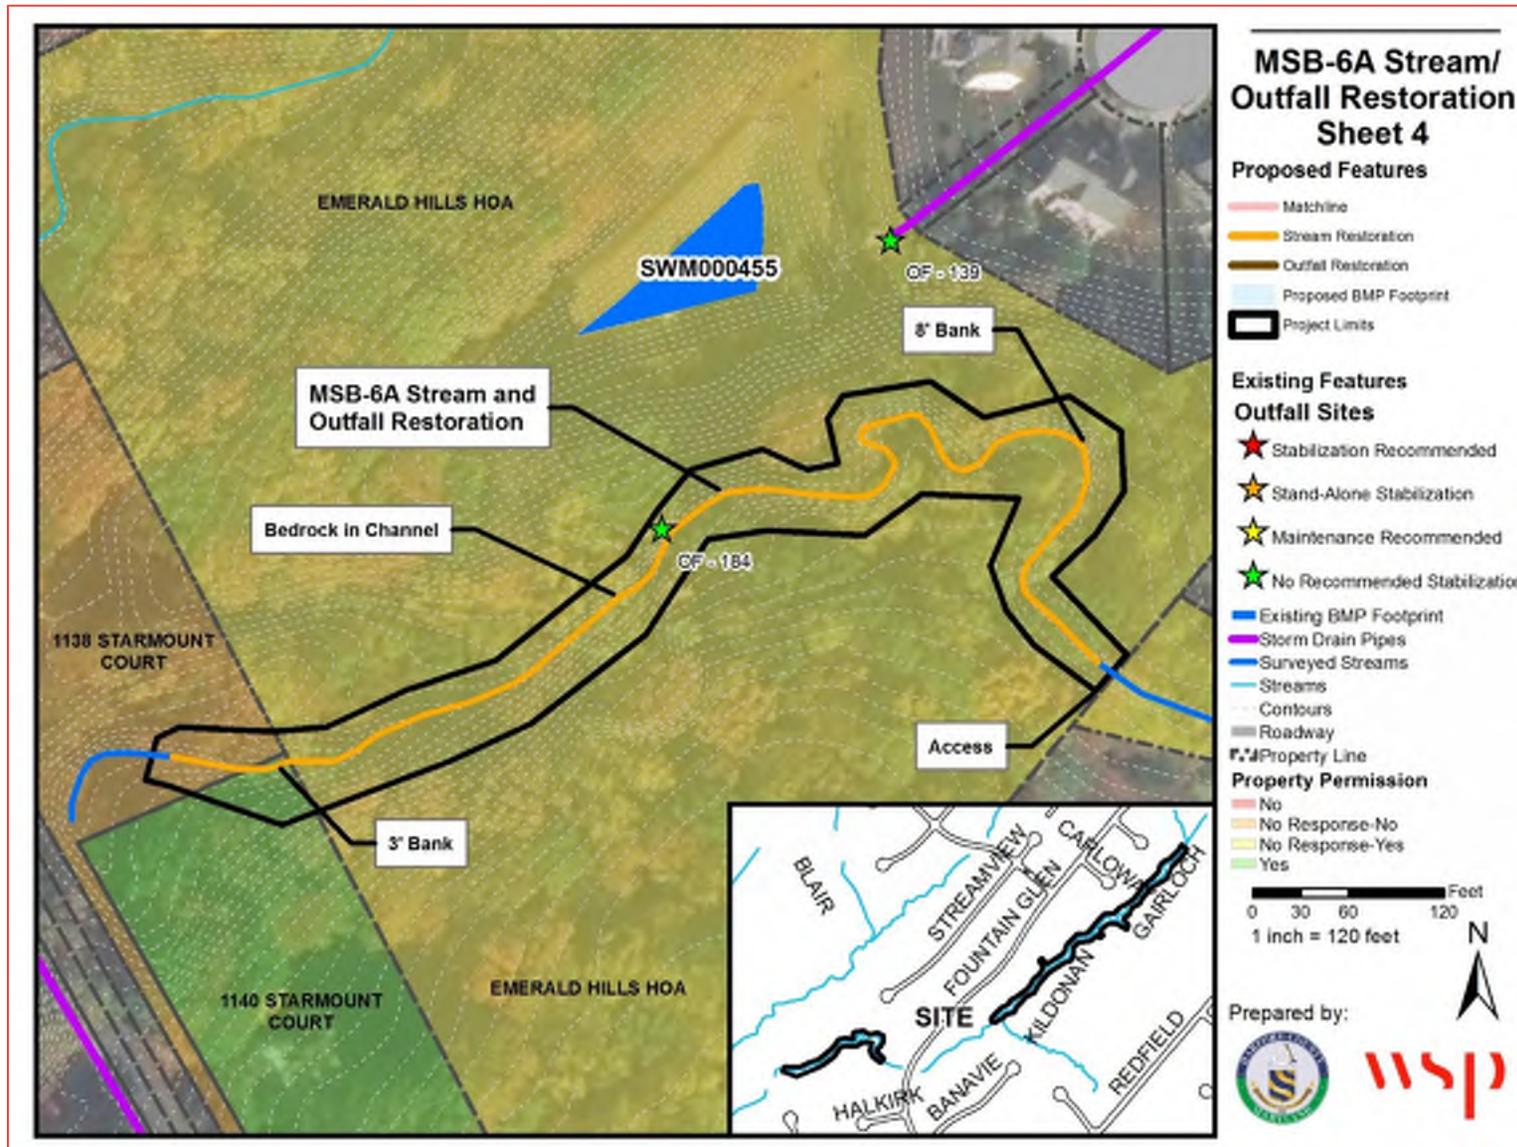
Site Location and Proposed Project Plan for MSB-6A Stream Restoration (Sheet 4 of 4)
